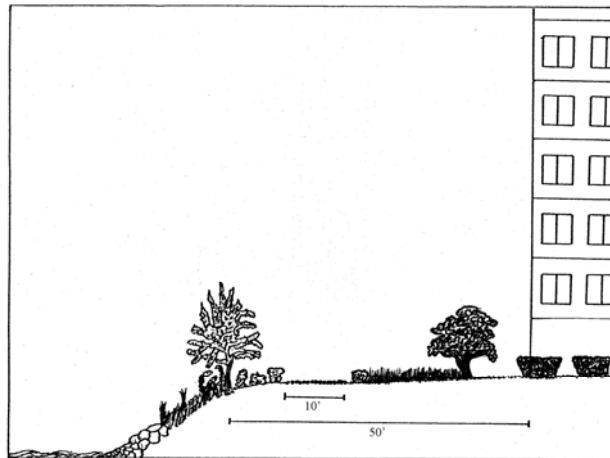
Hypothetical site plan showing a vegetated revetment on a site with parking on the ground level of the new structure. Drawing by Thomas VanHollebeke.
